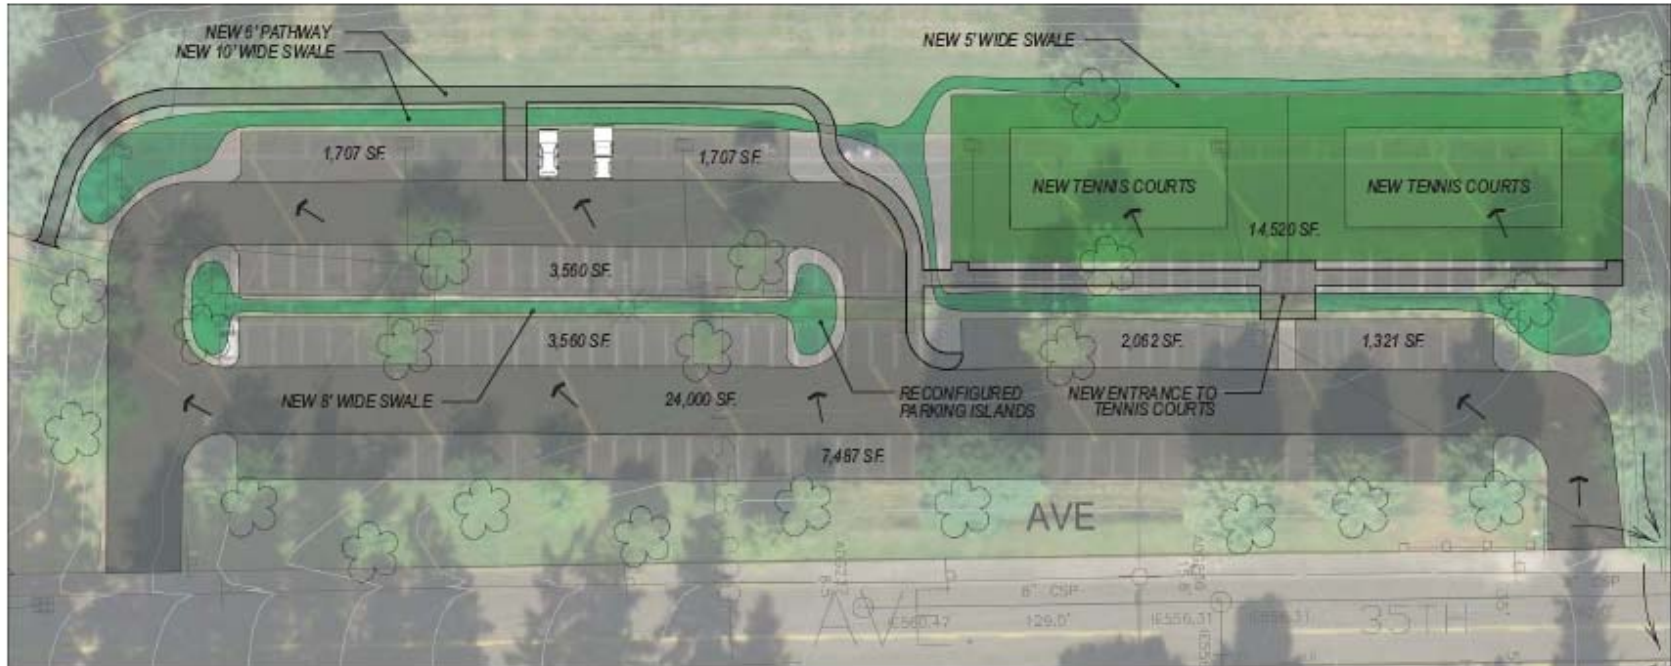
Jackson Middle School North Parking Lot Stormwater Retrofit Pre-design
